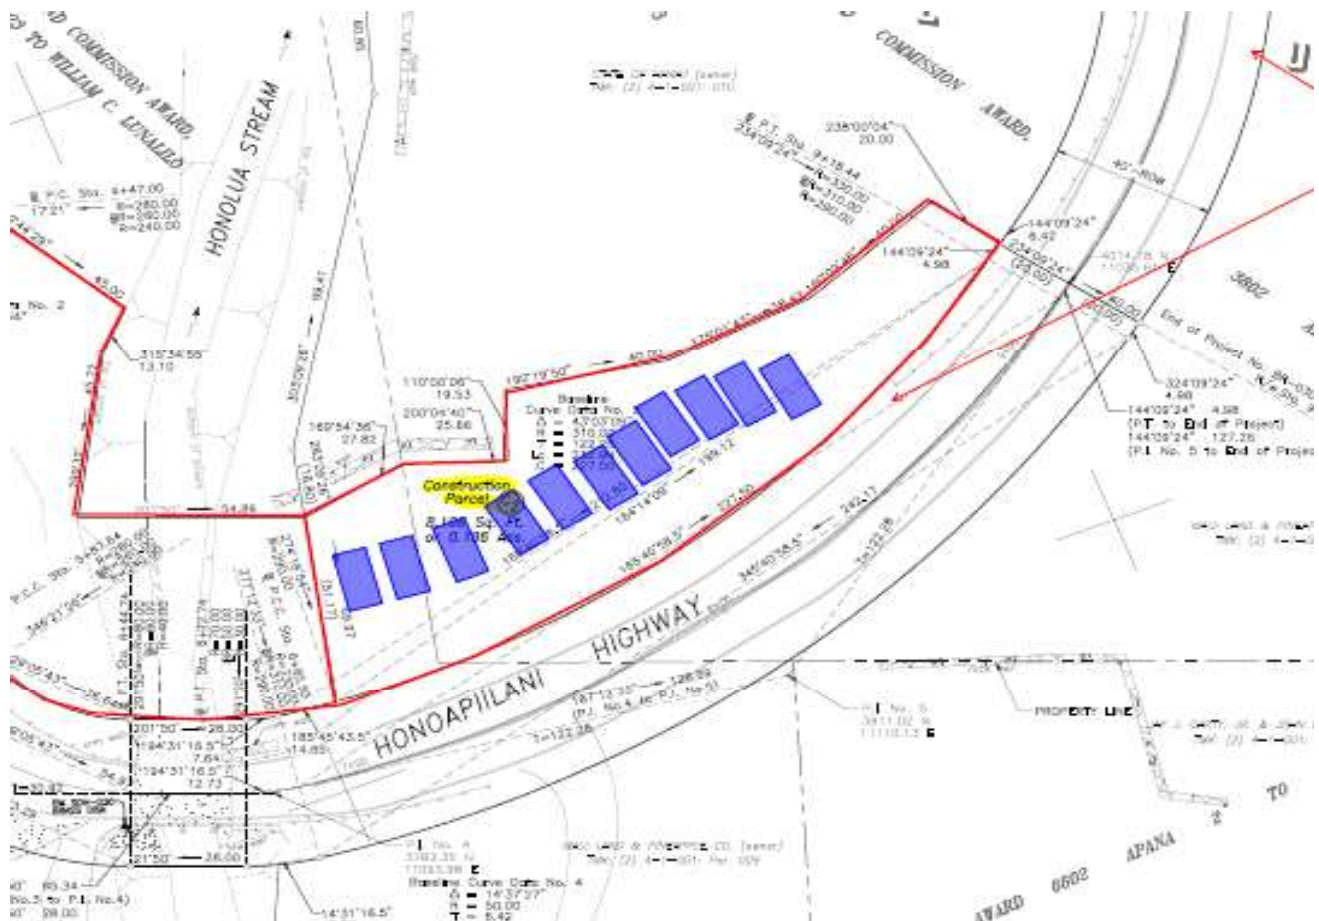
Site plan showing a portion of the parking stalls impacted by construction.
